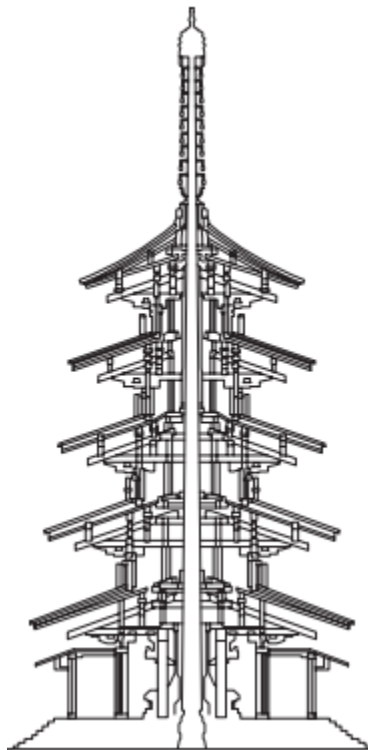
Horyu-ji Temple in Japan (MGB Architecture and Design et al.)
